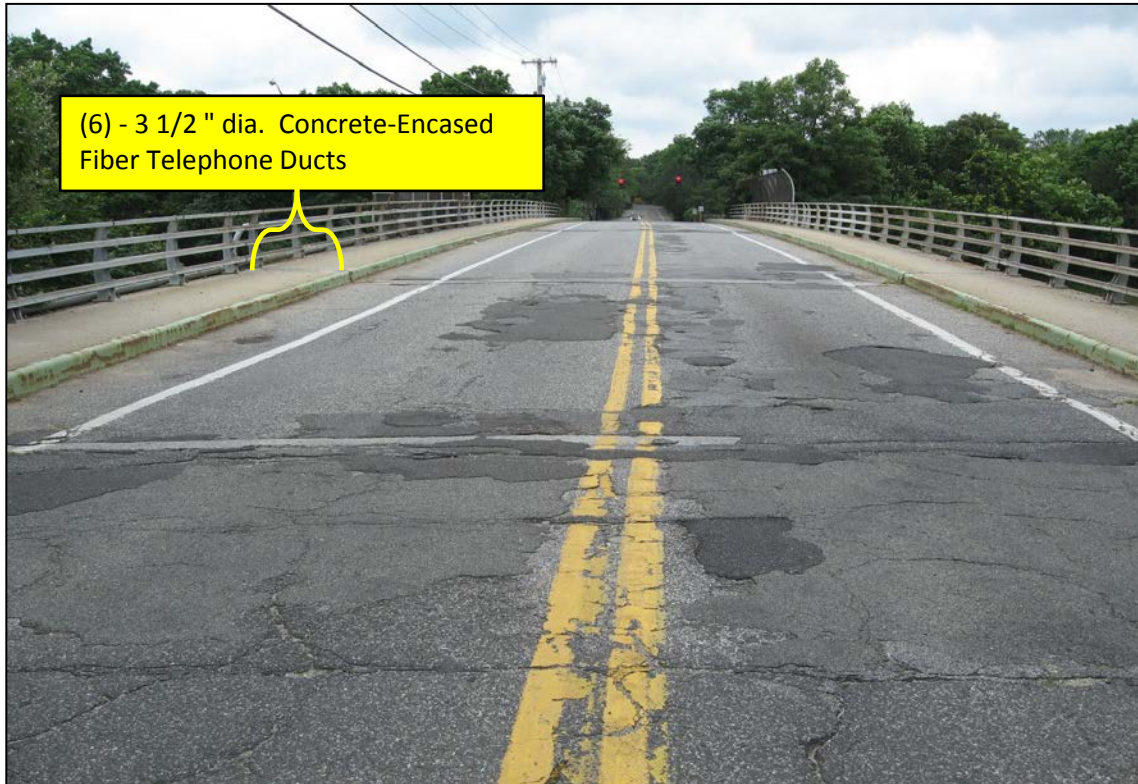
As indicated on the record plans, the (6) - 3 1/2" dia. Concrete-Encased Fiber Telephone Ducts, underneath the left (west) sidewalk, is a SACM. Photo is looking north, across the bridge deck, from the Begin Abutment.
